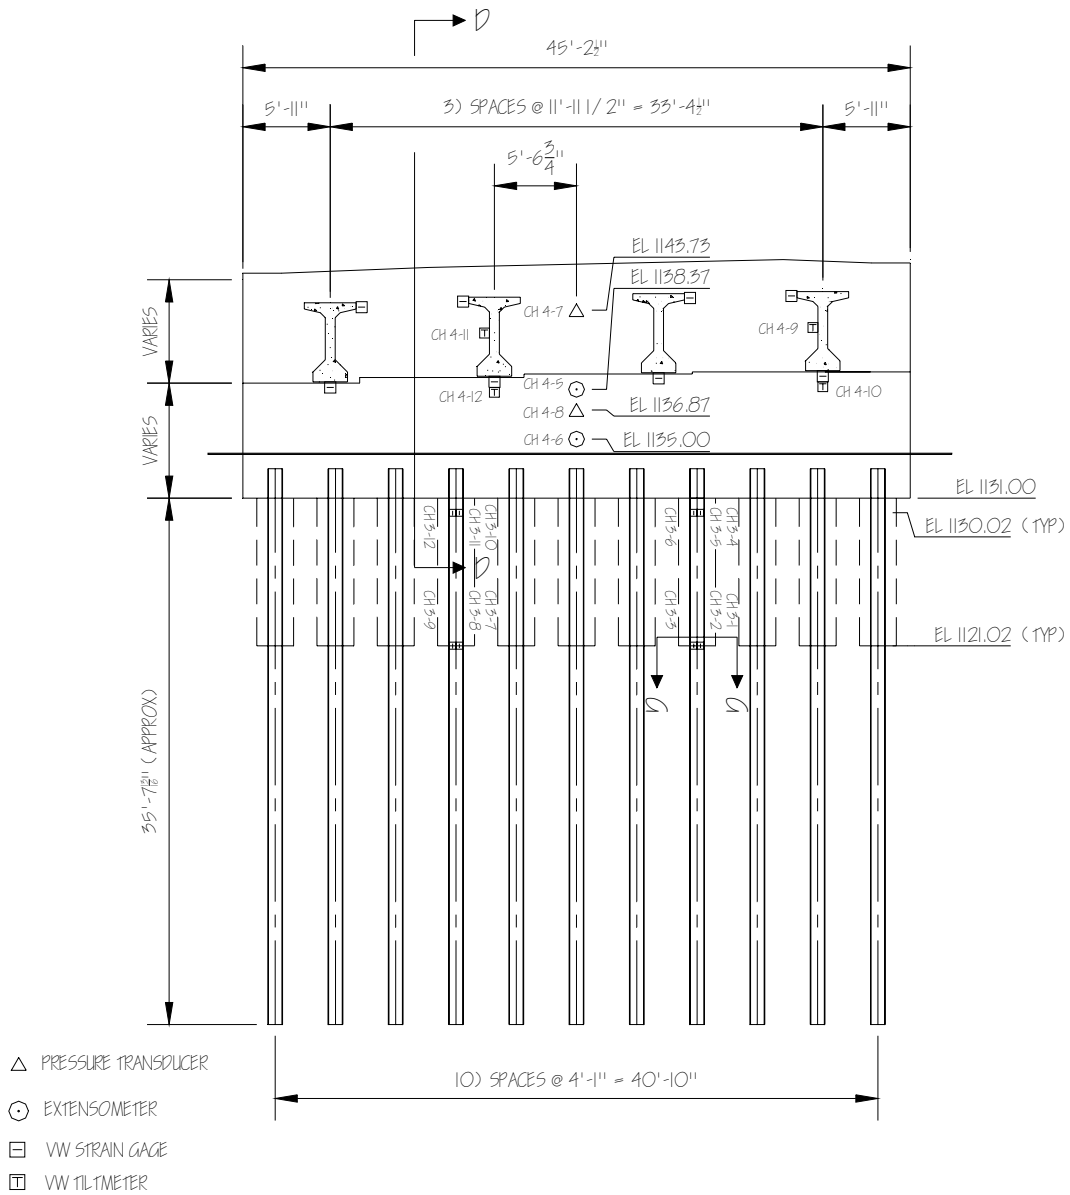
Structure 211 Abutment 1 Elevation (Section C-C)
